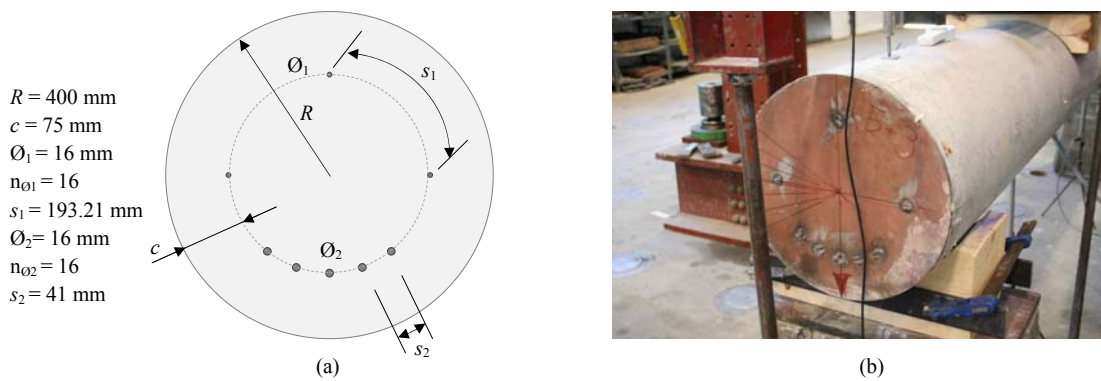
Asymmetric cross section: (a) cross section configuration; (b) steel plate at the end of the element to anchor the reinforcement
